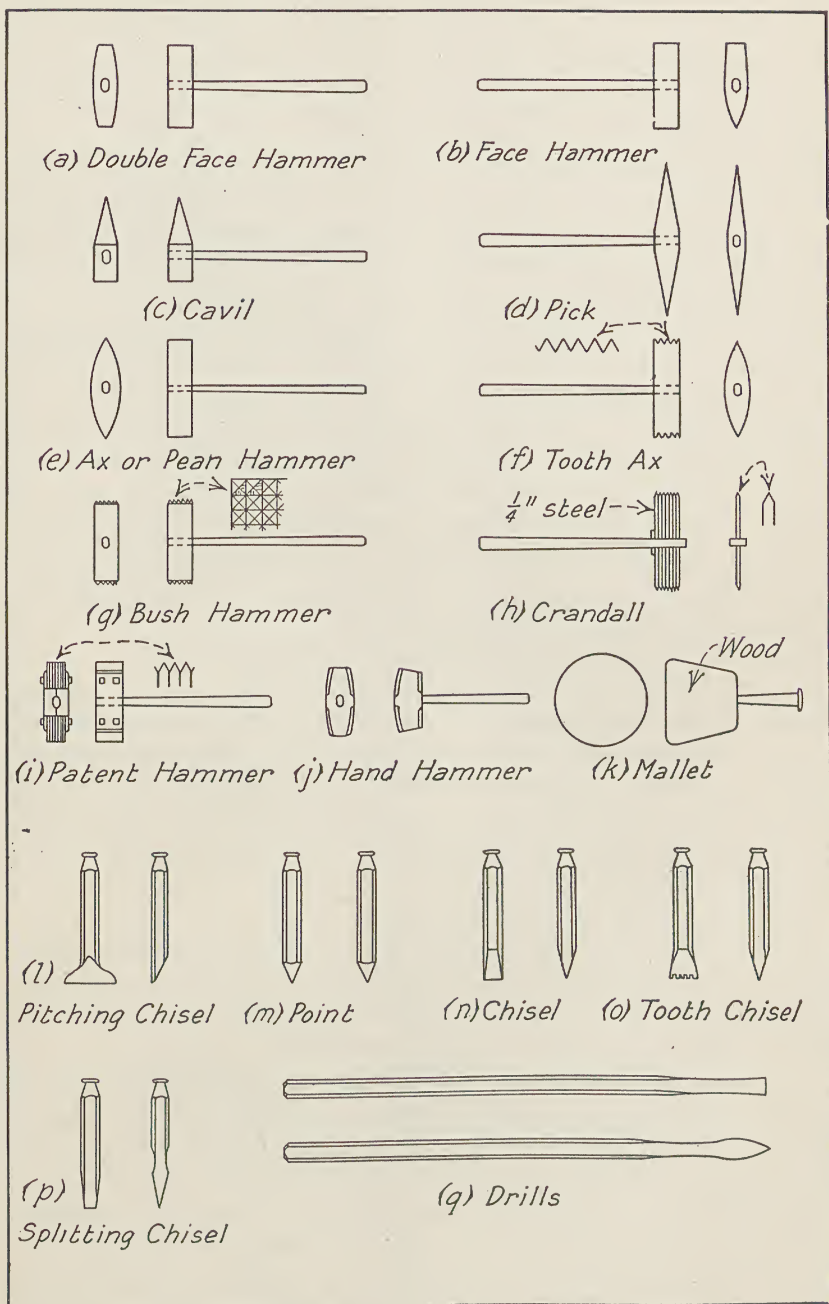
Hand Tools used in Stone Cutting and Finishing
